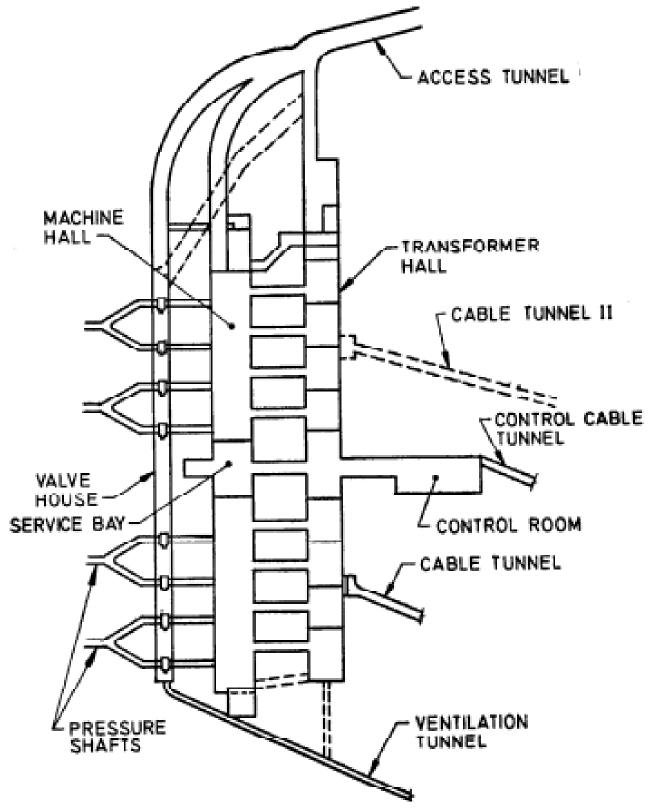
A LAYOUT OF PARALLEL HALL ARRANGEMENT IN POWER STATION
